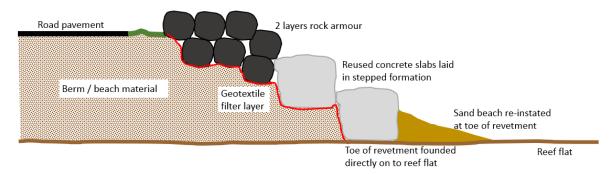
Cross-section of the proposed reconstructed revetment at Mosral
